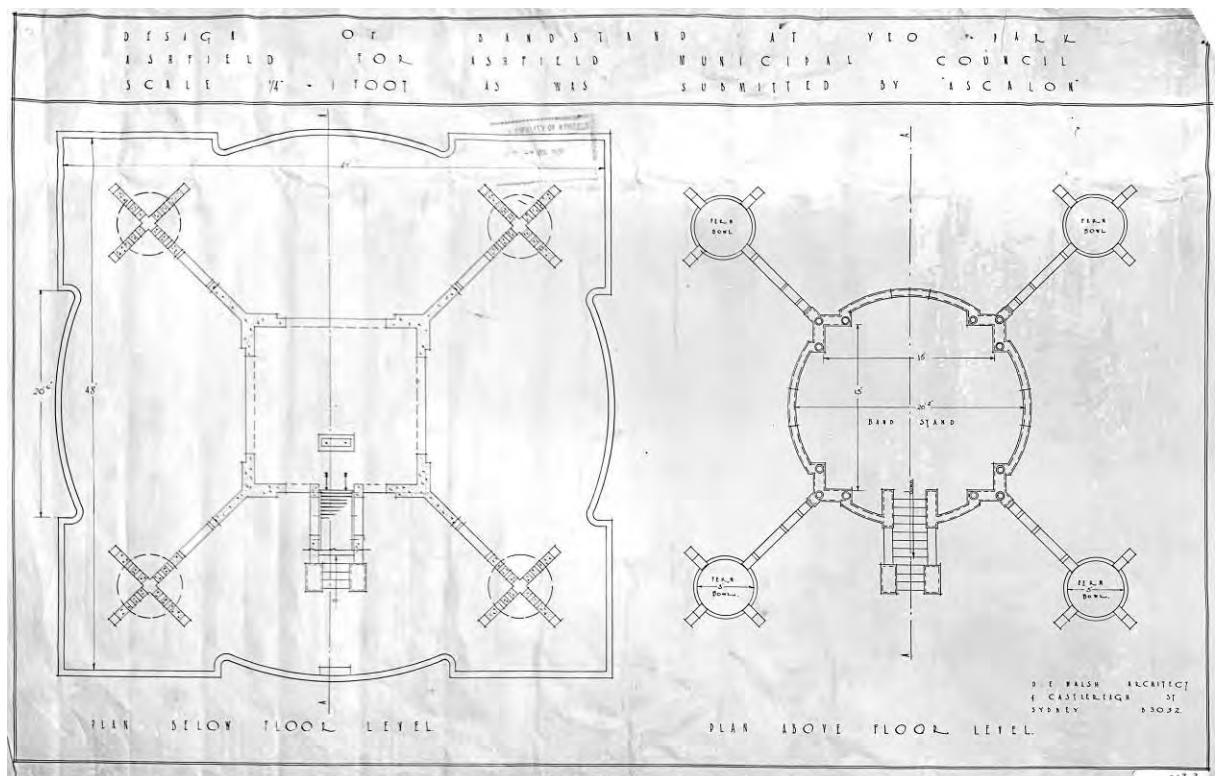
Ground and lower ground floor plan of the winning design by Walsh. Source: Inner West Council
